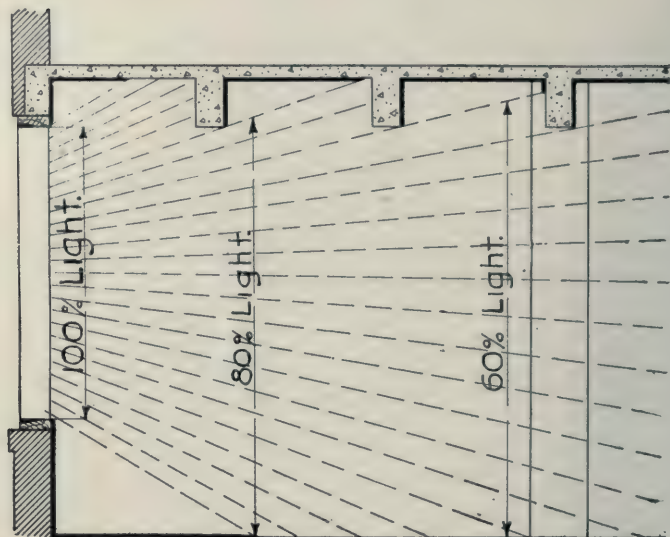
Fig. A. Reinforced Concrete Beam and Girder System. Beams and Girders Block Light Rays.
